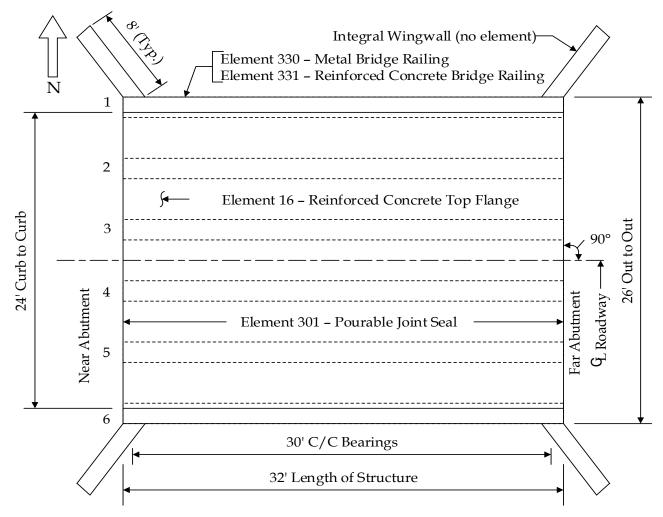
Plan View of Reinforced Concrete Tee Beam Bridge
